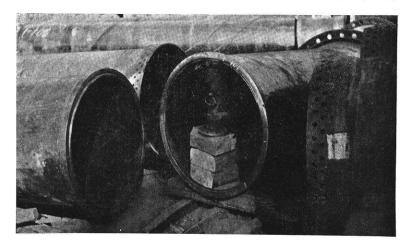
Lap Welded Penstock Pipe Showing the Two Kinds of Joints, the Flange Bolted and the Bell and Spigot Riveted.
